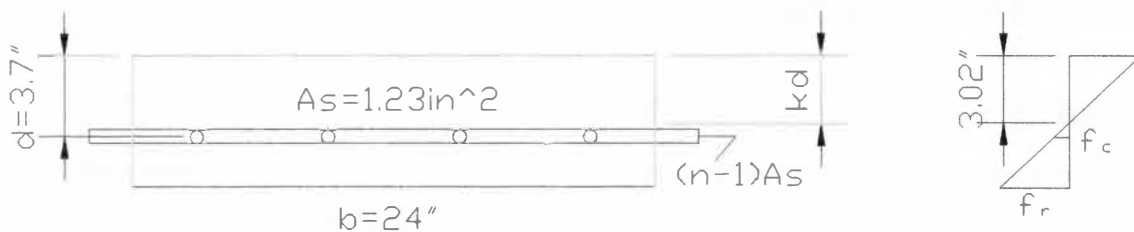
Cross Section Before Cracking and Stress Distribution
